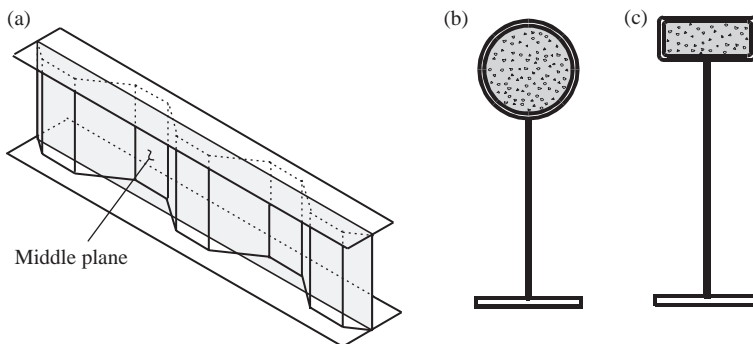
Unconventional bridge girder systems: (a) corrugated web I-girder; (b) & (c) concrete-filled tubular flange girders.
